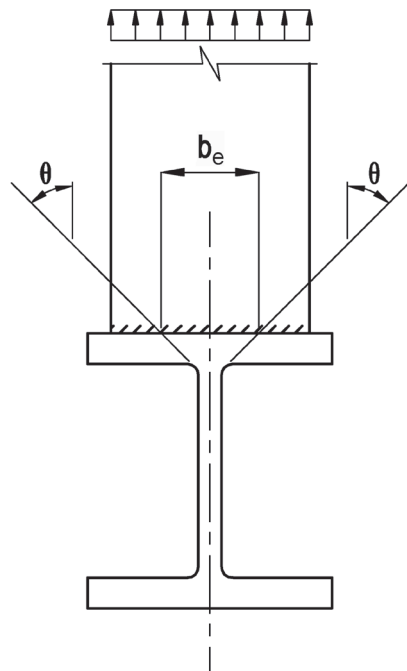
Effective width of a plate welded to a column flange.
